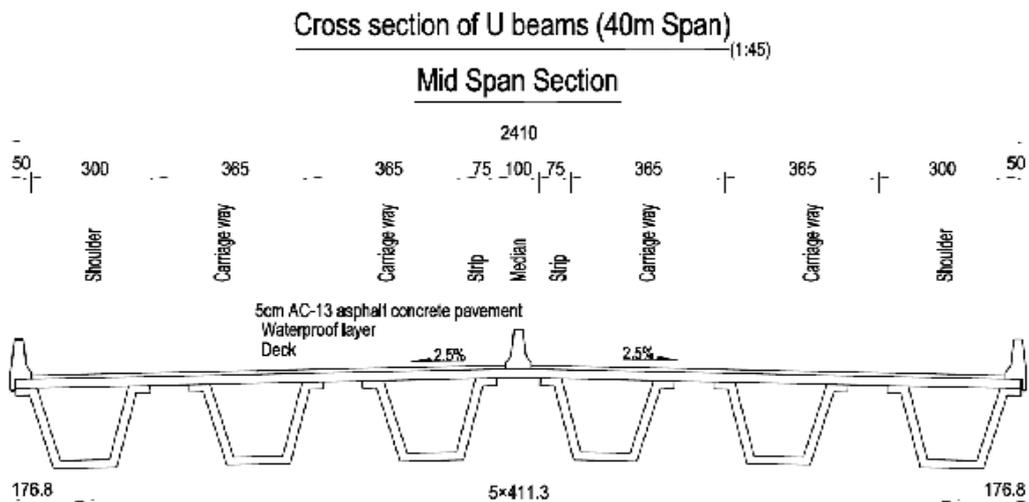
Cross-Section of 40m U-shaped Beam Superstructure
